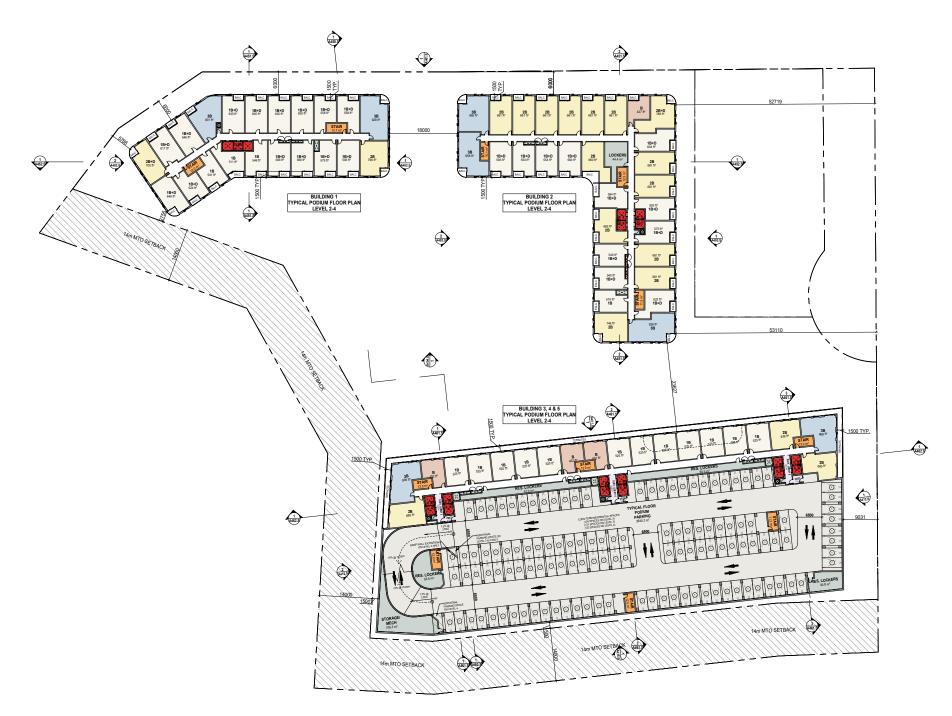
TYPICAL PODIUM FLOOR PLAN - FLOORS 2-4 (BDP. QUADRANGLE ARCHITECTS LTD.)
